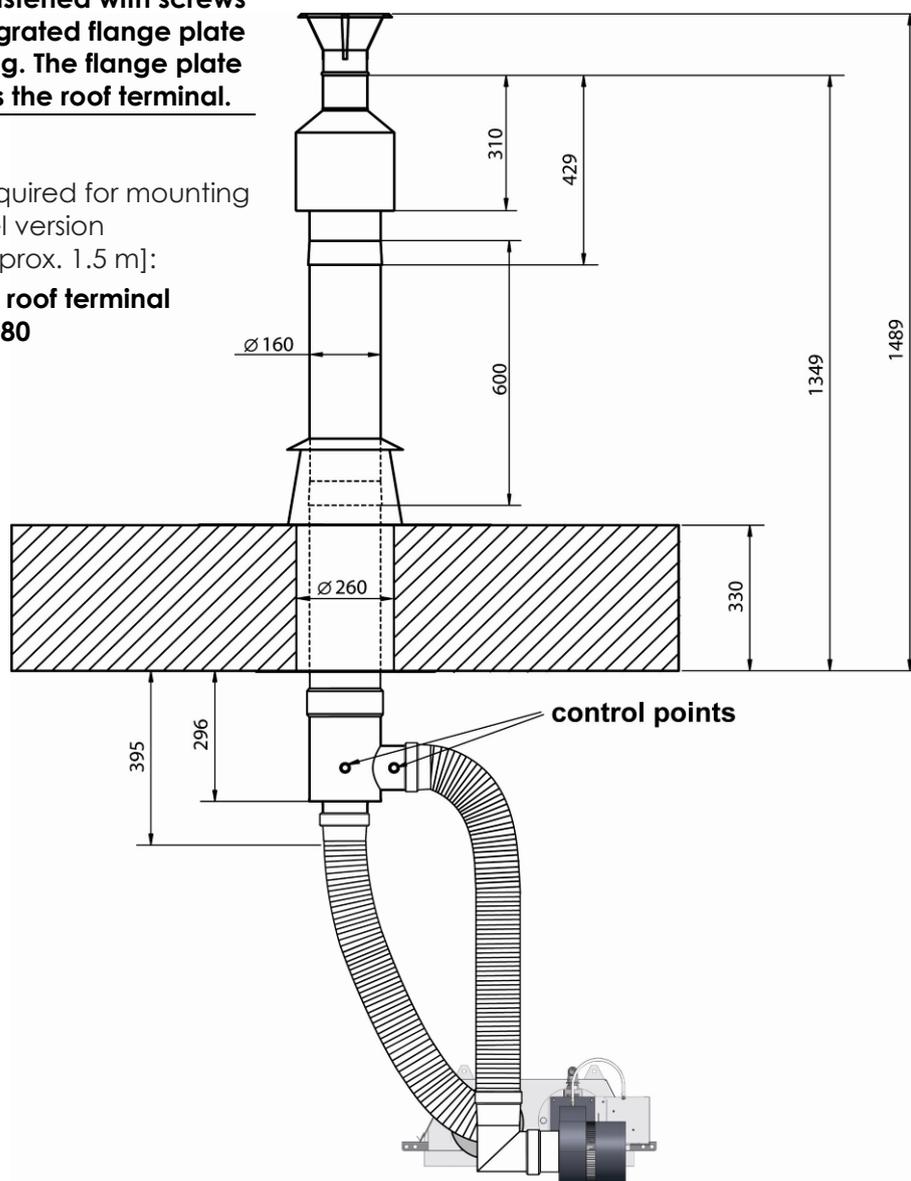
Position of control points 15 – 60U [roof terminal], version stainless steel
